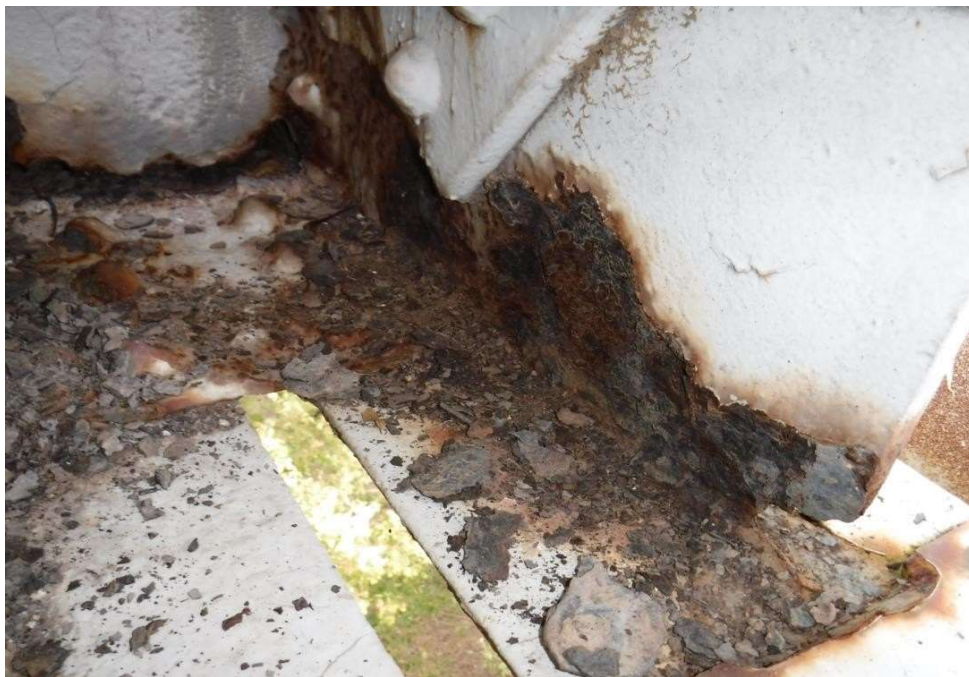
Lower chord gusset plate condition at Joint L7, Truss 1, Span 6
